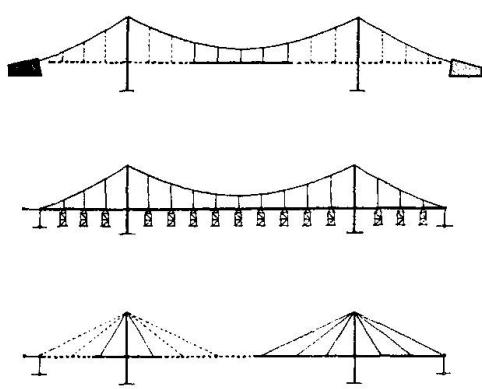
The earth-anchored suspended girder needs abutments but can be built without false-work. The self-anchored girder needs temporary falsework but avoids horizontally loaded foundations. The cable-stayed girder combines both advantages.
